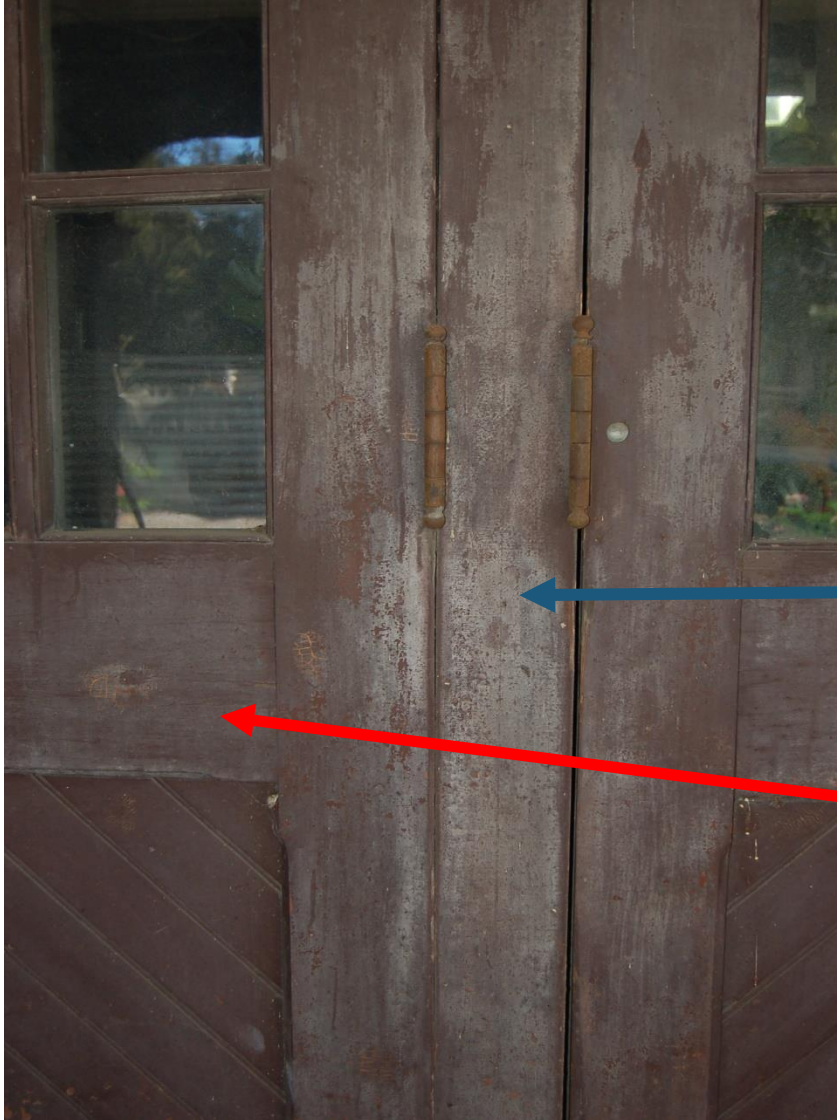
detail of door where testing was undertaken, also shows variation in density of bloom
